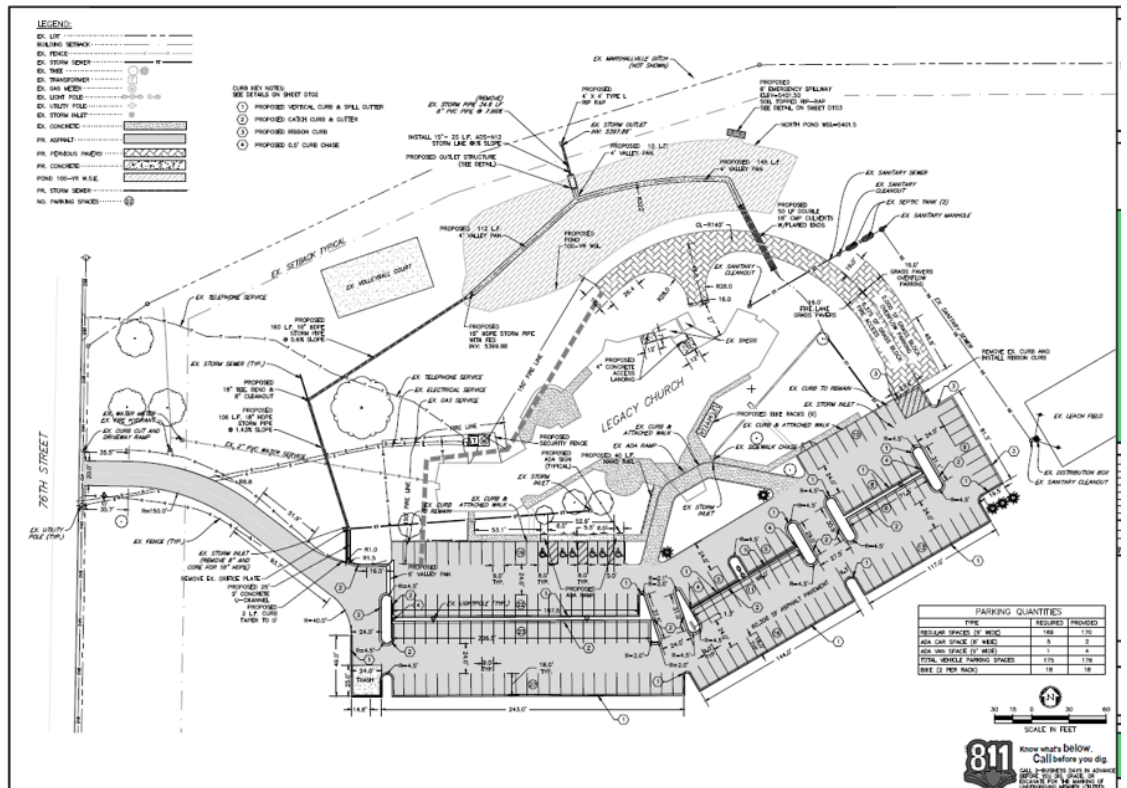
Site plan with proposed parking lot and stormwater improvements.
